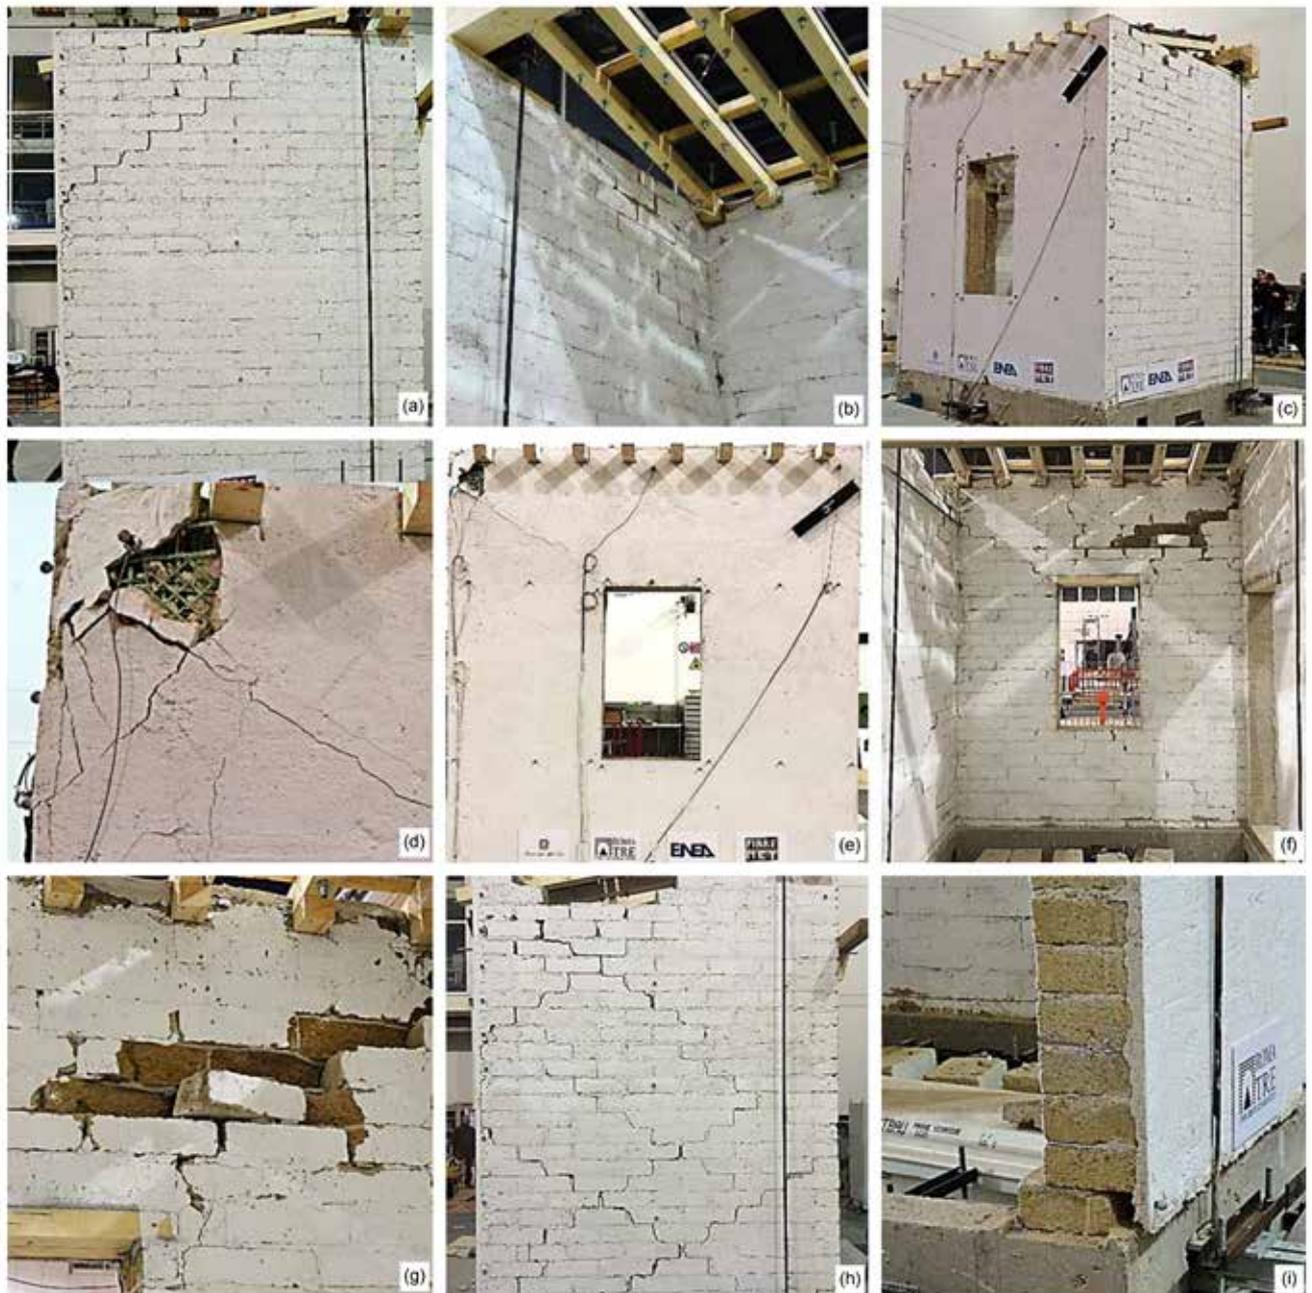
Damage in the reinforced sample: internal cracking (a) and external cracking (b) on the right wall AQV120, installation of the steel tie rod after AQV120 (c), detail of the final crack pattern on the left corner of the front facade (d), external cracking (e) and internal cracking (f) of the central wall at the end of the test, detail of the crushing of the internal tuff elements in the wall (g), crack pattern at the end of the test on the right wall (h), sliding of the left wall from the foundation (i).
